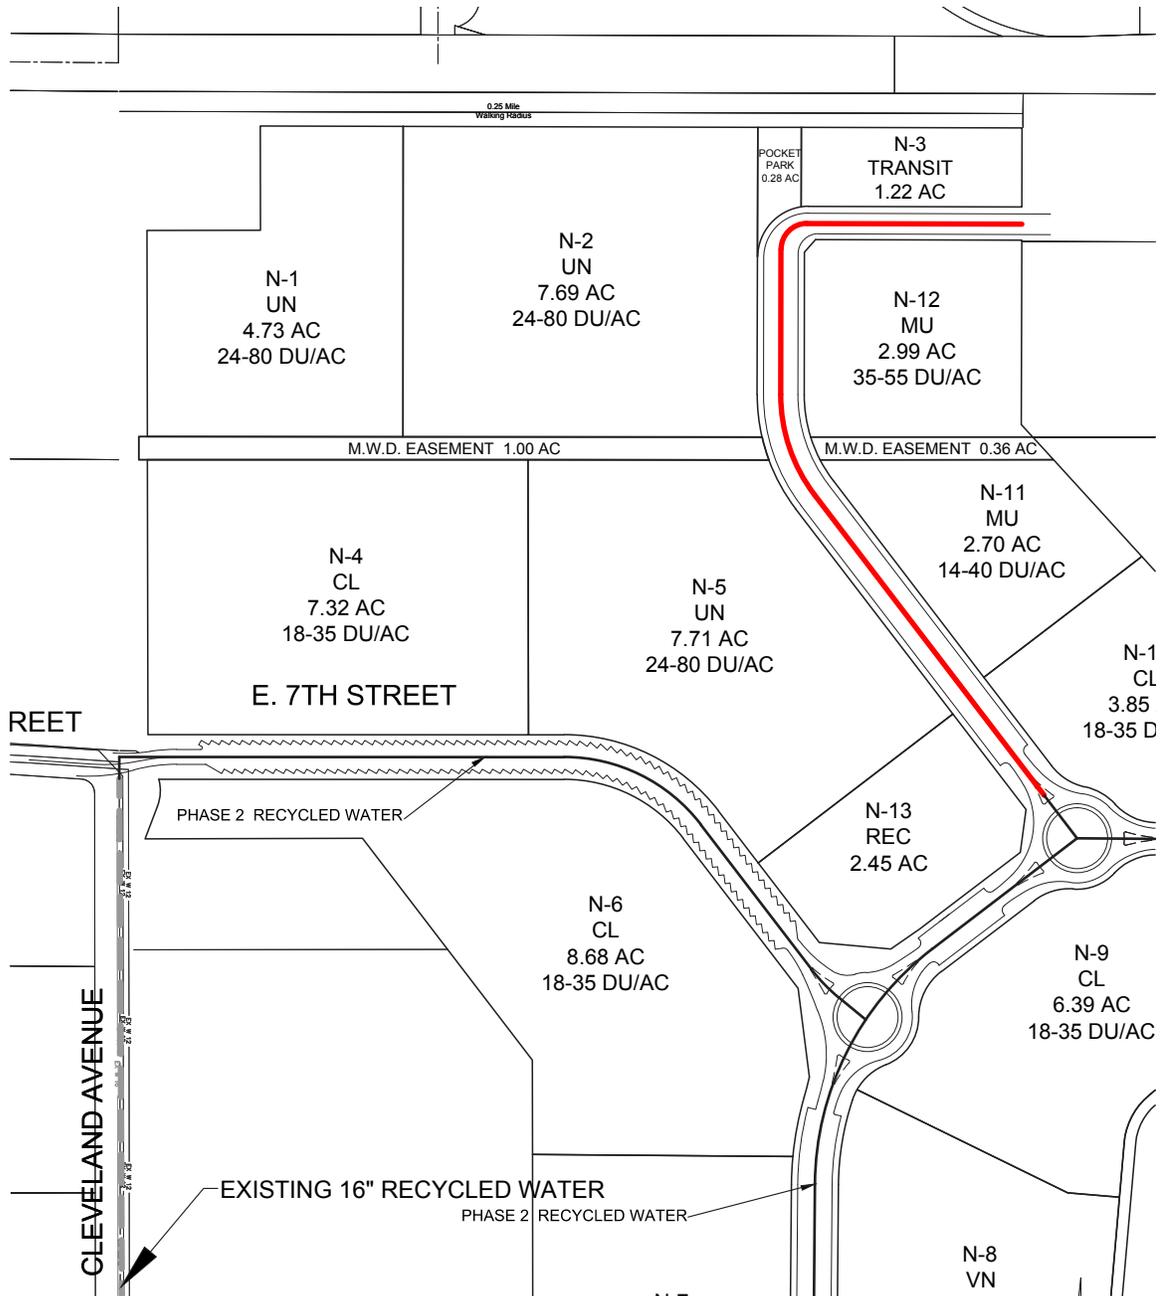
Conceptual Phase 3 Recycled Water Facilities Plan
